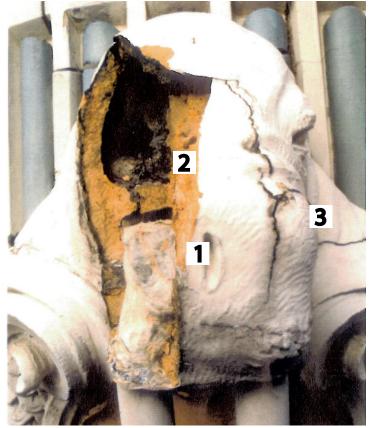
1996 inspection photo of walrus head S-1. Note the white grout sections filling the sinus cavity area of the walrus head (1). This meant there was no space left for the grout to expand into when the gypsum got wet. Note also the crack in the internal webbing (2). The damage to the internal structure of the head was so severe that this head had to be replaced. Note the cracks radiating from the dot on the top right of the walrus snout (3). This dot is the injection point for the 1982 grout installation and created a weak point in the terra cotta. Credit: Slaton & Morden, WJE
